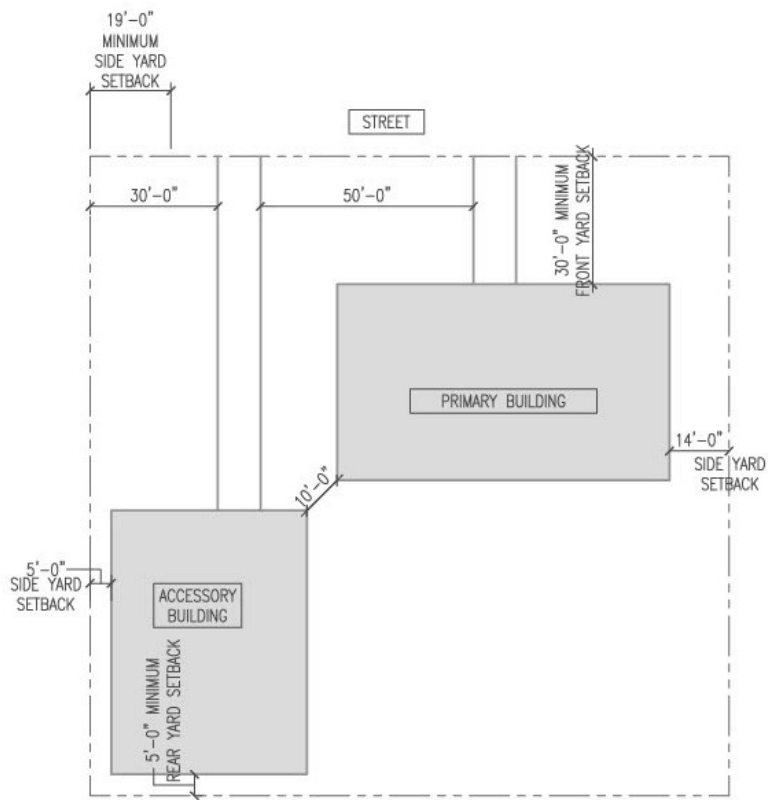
DETACHED ACCESSORY BUILDING EXAMPLE 2
